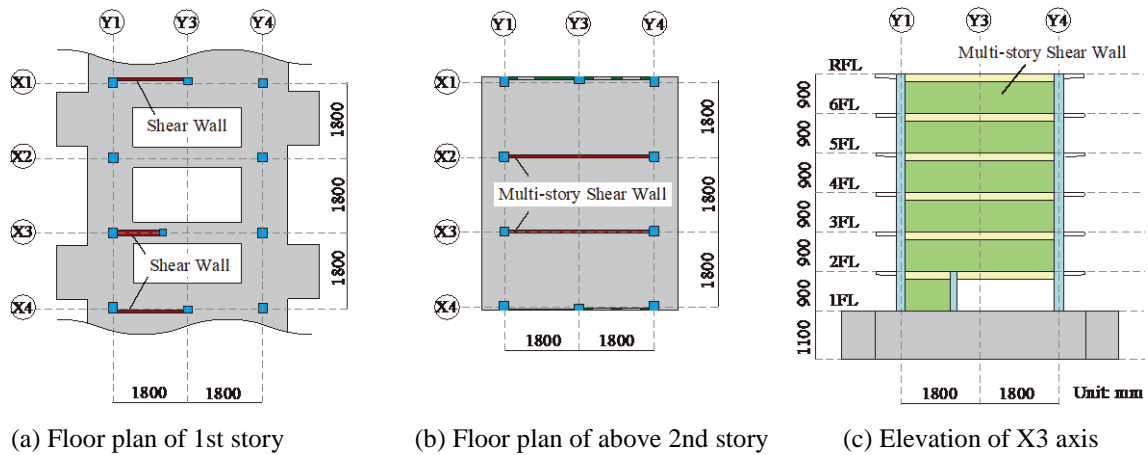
Floor plan of 1st story and above 2nd story, and elevation.
